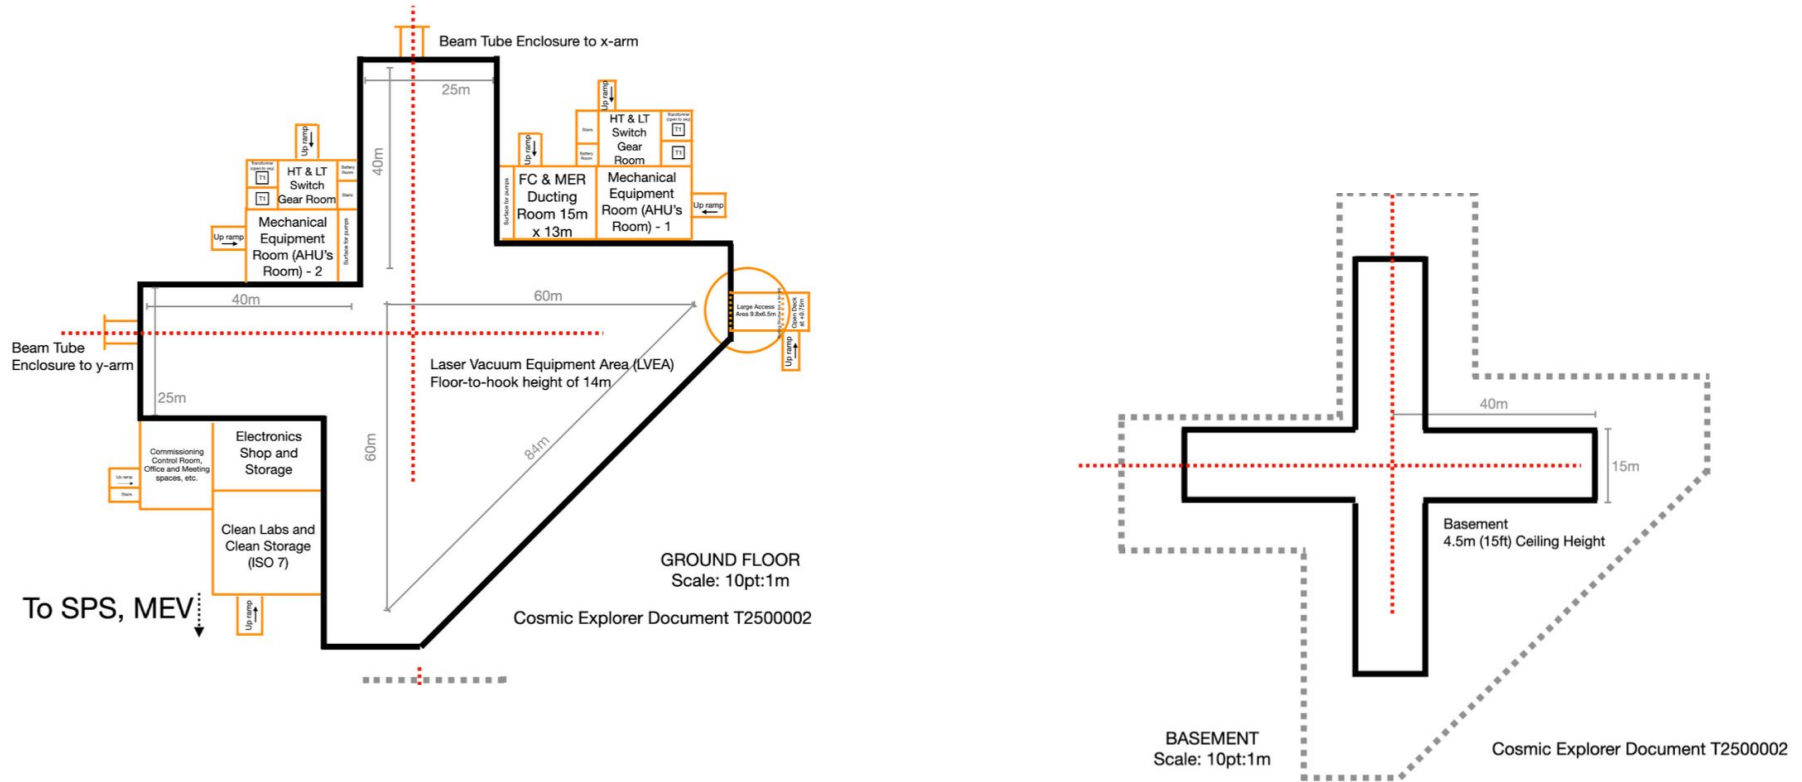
Sketch of the Central Station VEA Building. *Top:* Ground floor plans, based on the LIGO India Corner Station (figure 14) and the CE technical layout. *Bottom:* Basement plans. <https://dcc.cosmicexplorer.org/T2500002>
